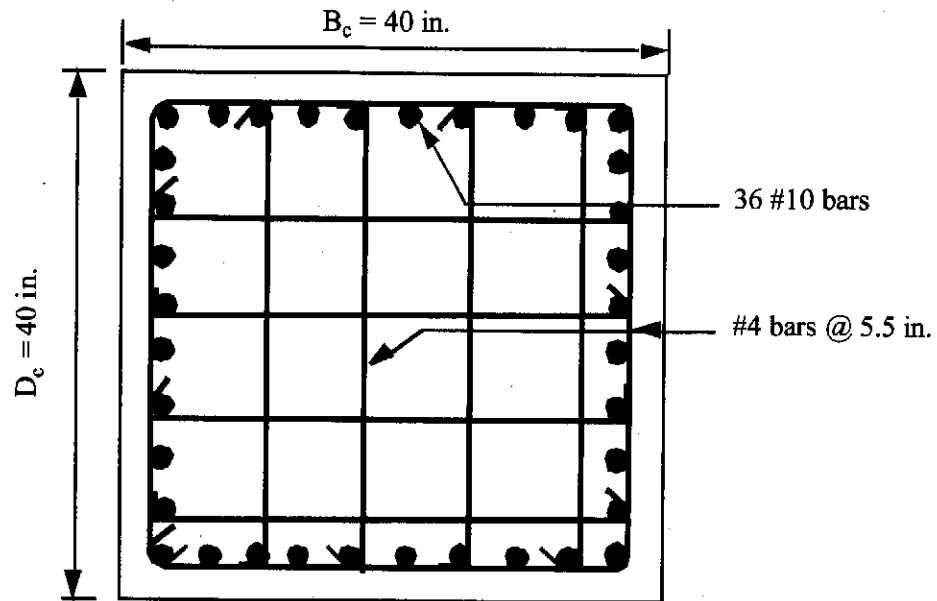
Reinforcement details for interior column 1 (between grade and floor 2) and column 2 (between floor 2 and floor 3)
